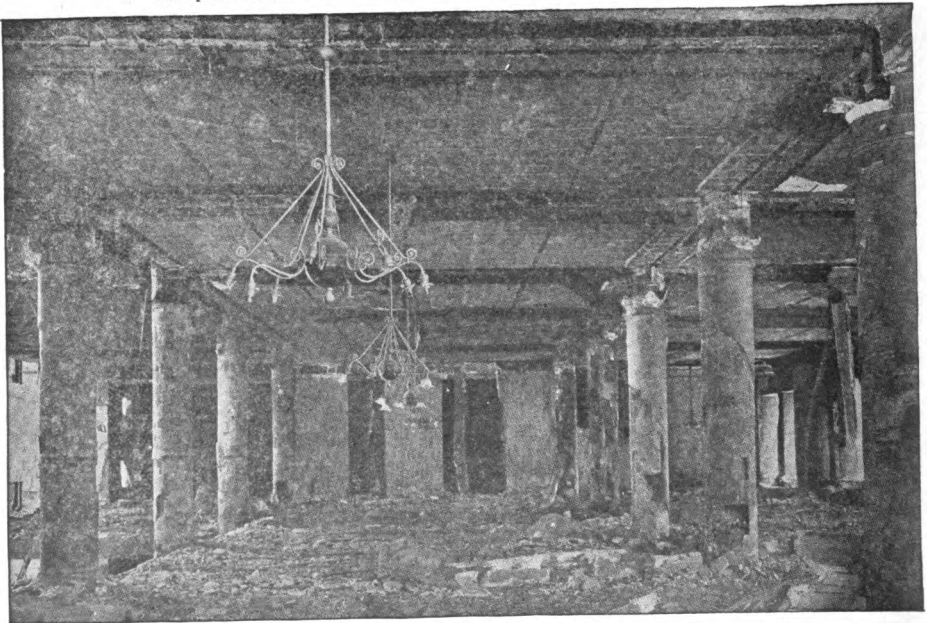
Well Applied Fireproofing Protection Always Protects the Structural Parts
